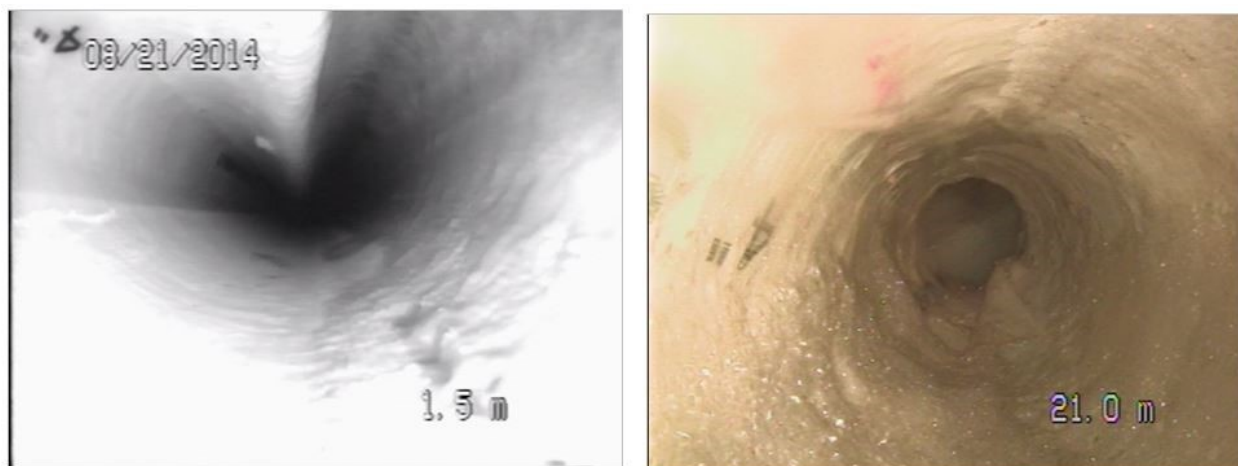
Lined pipe sections connected by PVC pipe (Matthews et al., 2015)
